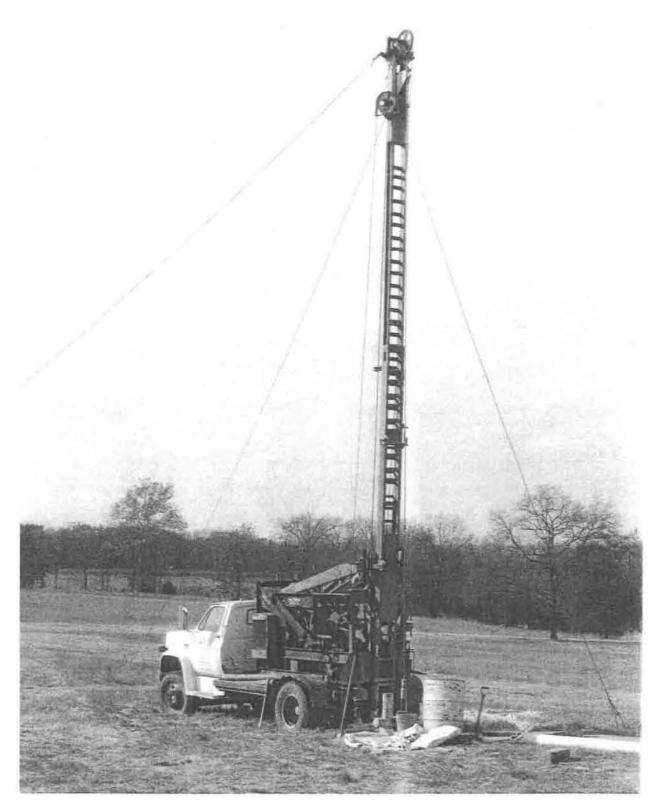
Cable tool drilling rig. Photo by Jim Vandike.
